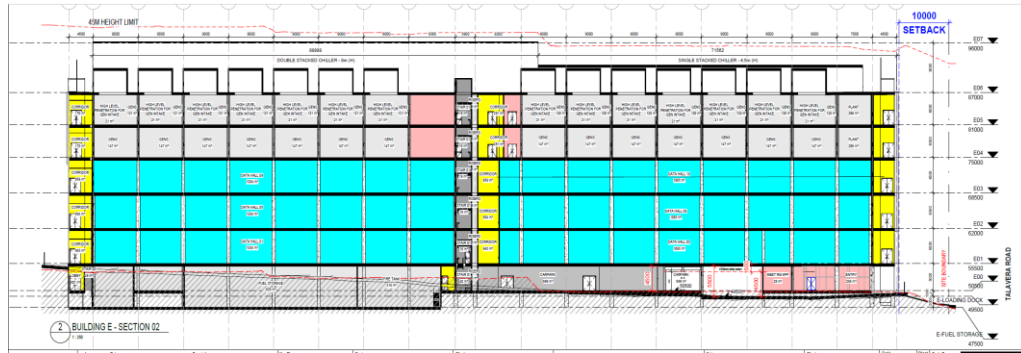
Section of Draft Architectural Plan (Source: Greenbox Architecture)
